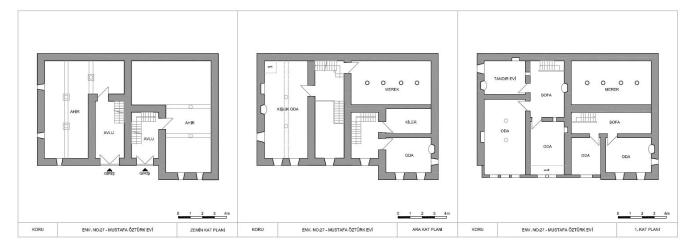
Mustafa Öztürk House Plan Scheme (Example of a two-story "merek").
